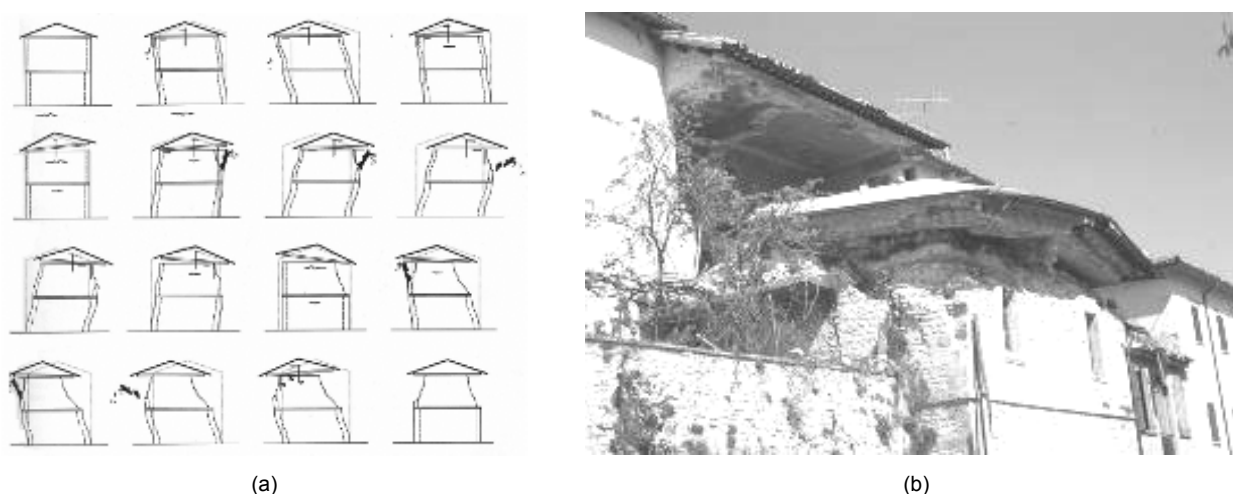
Structural failure due to the insertion of a stiff R.C. roof (a) (Avorio, 2002), (b) (Binda et al., 2006).
